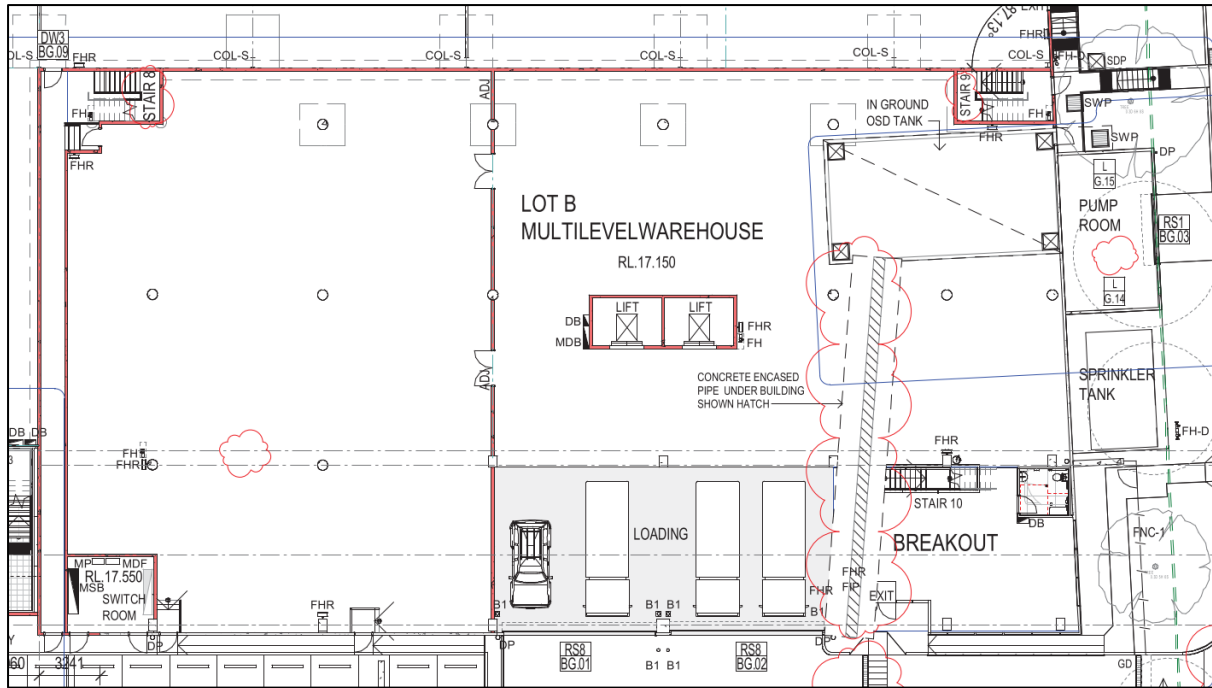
Extract of the approved ground floor – Lot B Building 1, in CDC-20083.
